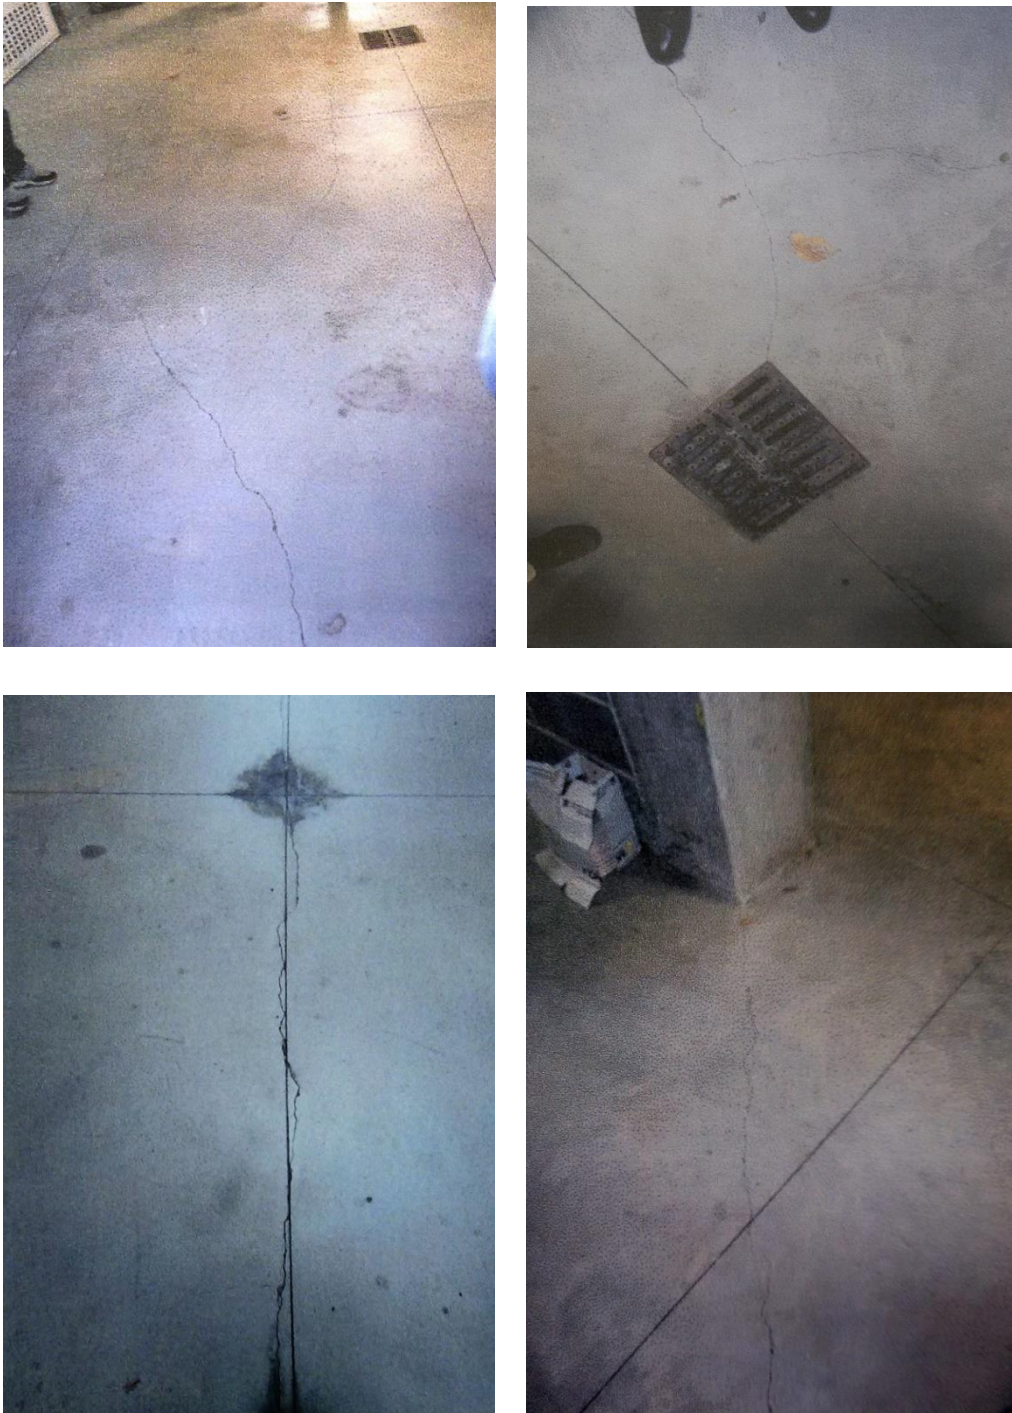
N° R.G. 10155/2012 Crack on the concrete flooring of a garage
